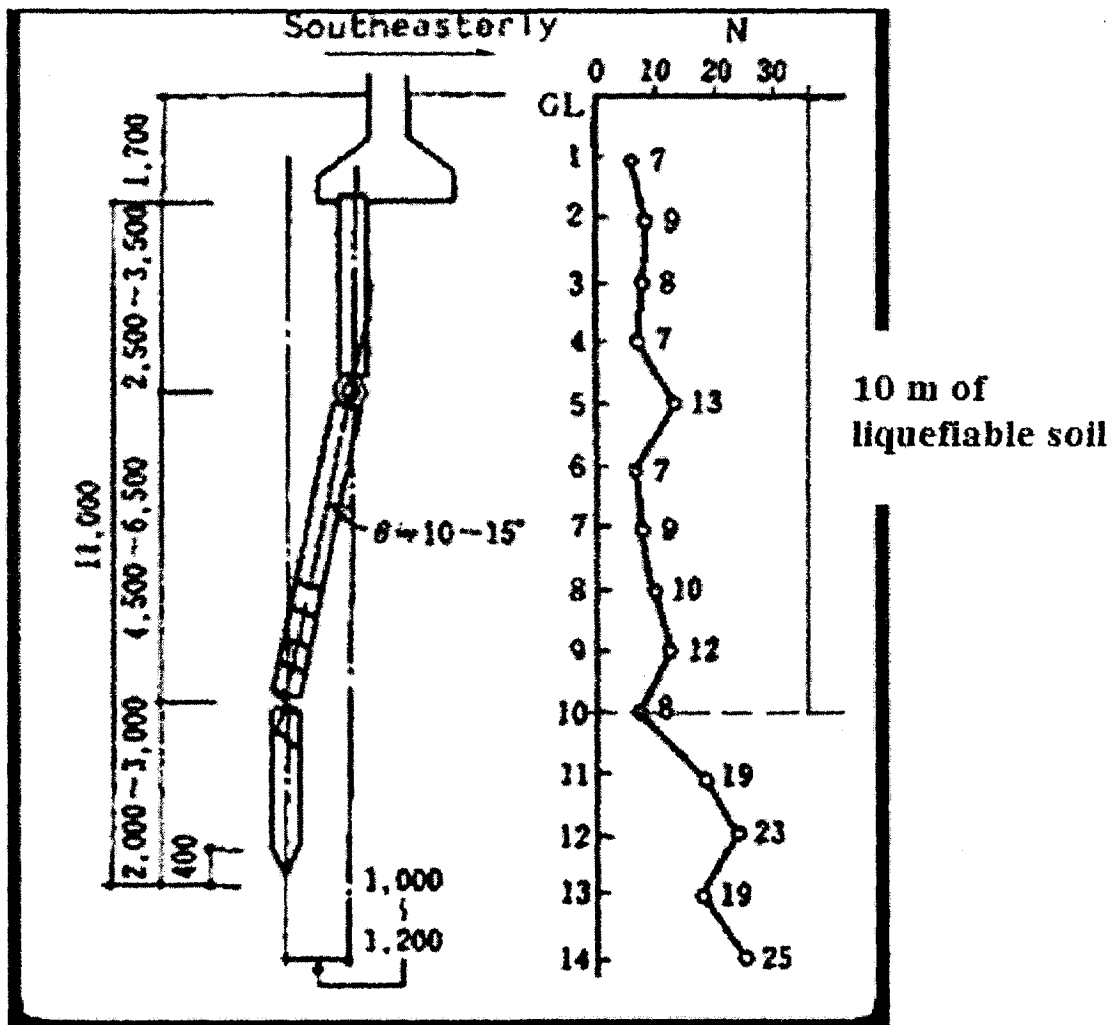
Failed Pile of N H K Building (Hamada, 1992)
